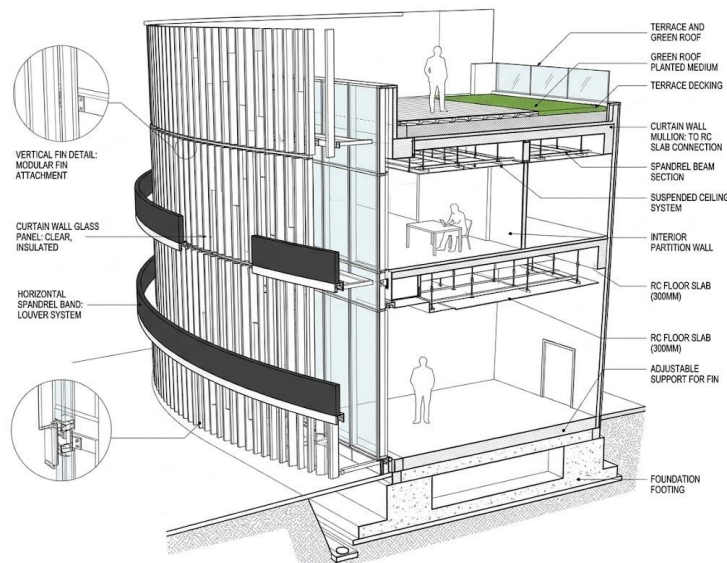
Technical Wall Section – Integrated Facade and Structural Assembly
